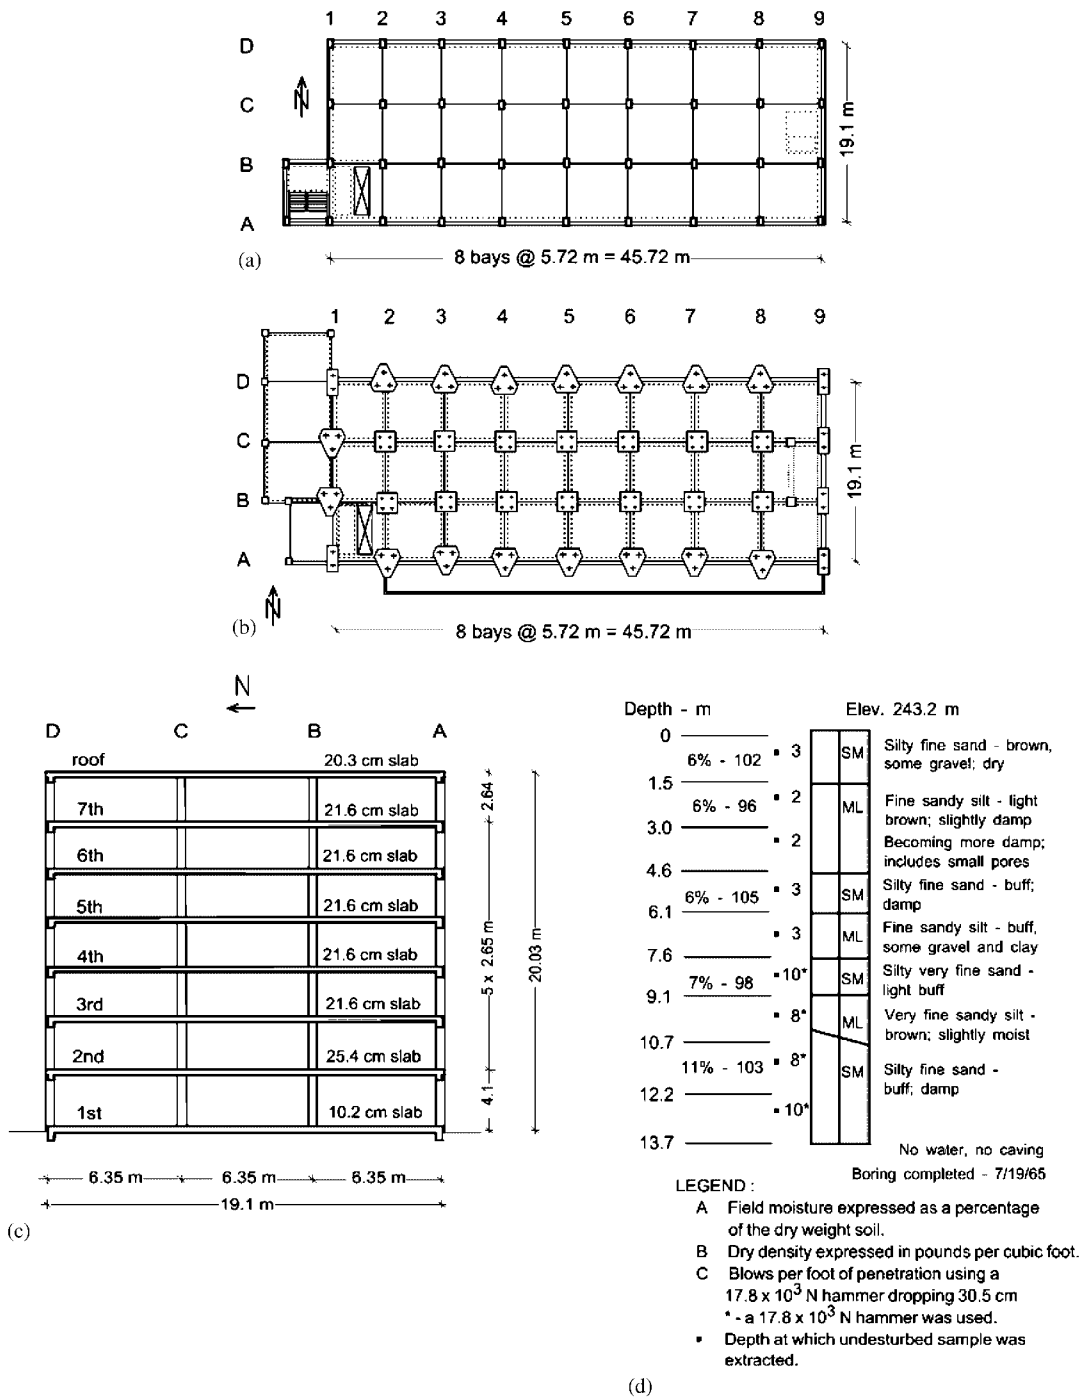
VN7SH building: (a) typical floor plan; (b) foundation plan; (c) typical transverse section; and (d) soil boring data from 17 July 1965.
